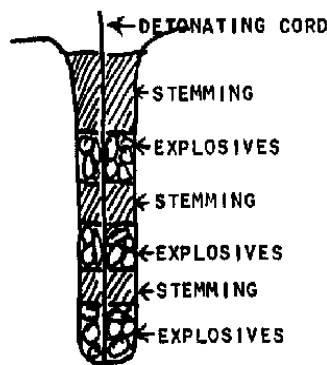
"Alternating Layers of Explosives for Post-Hole Blasting"
